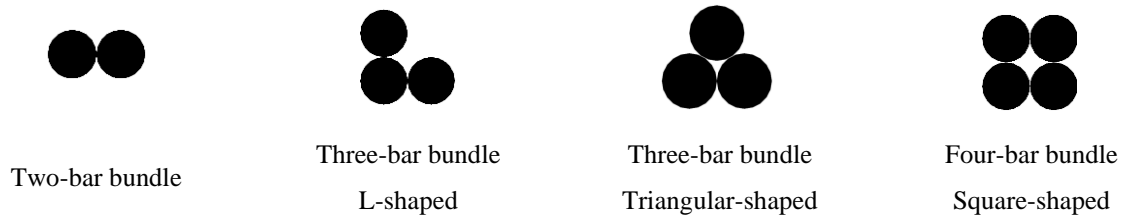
Typical Bundled Reinforcement Shapes in Concrete Columns and Bridge Piers
